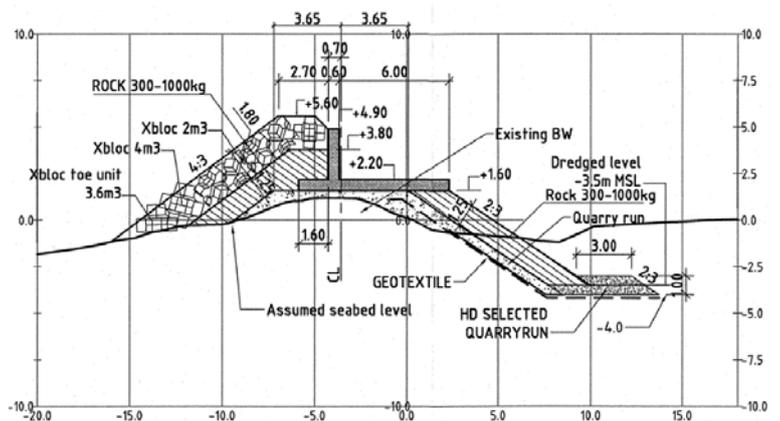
Cross section of breakwater at location A (see appendix XV, cross section 11)
